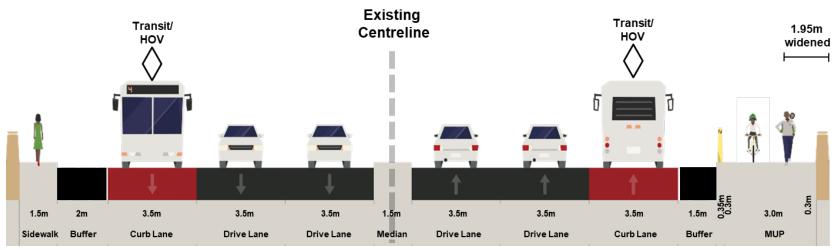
Alternative 3 - Structure Widened by 1 Girder, 1 MUP, 1 Sidewalk (No Road Shift)
